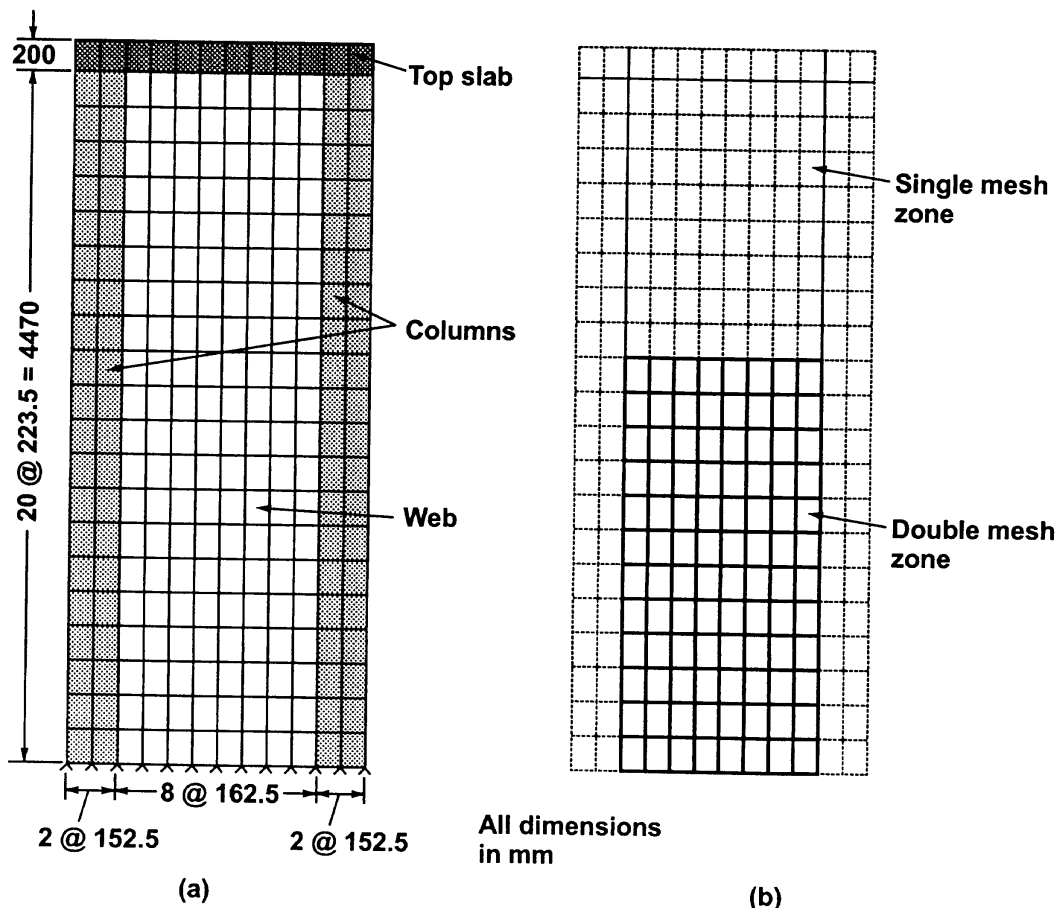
Finite-Element Model of Wall B5: (a) Elements Representing Initial Structure; (b) Elements Representing Replaced Wall
